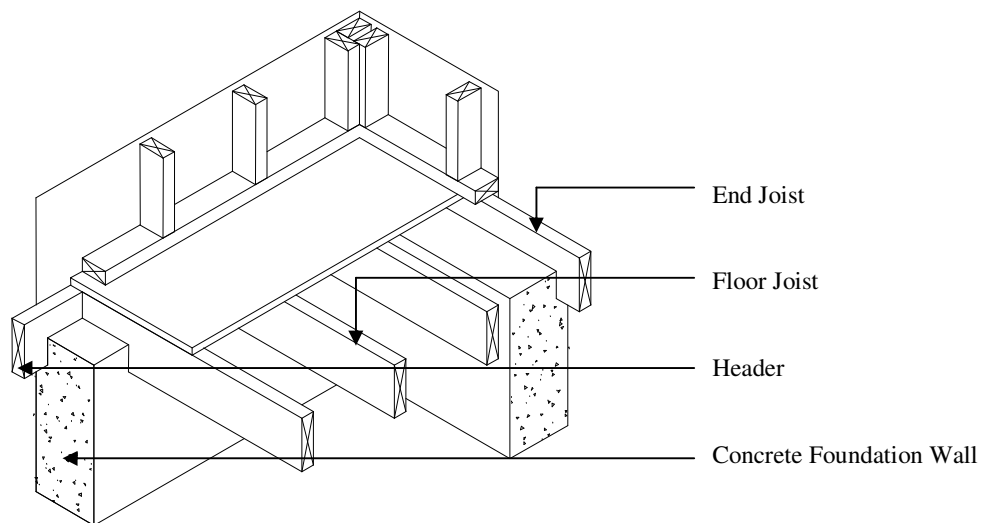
Floor Joists supported on a ledge formed in the foundation wall. [11,12]
